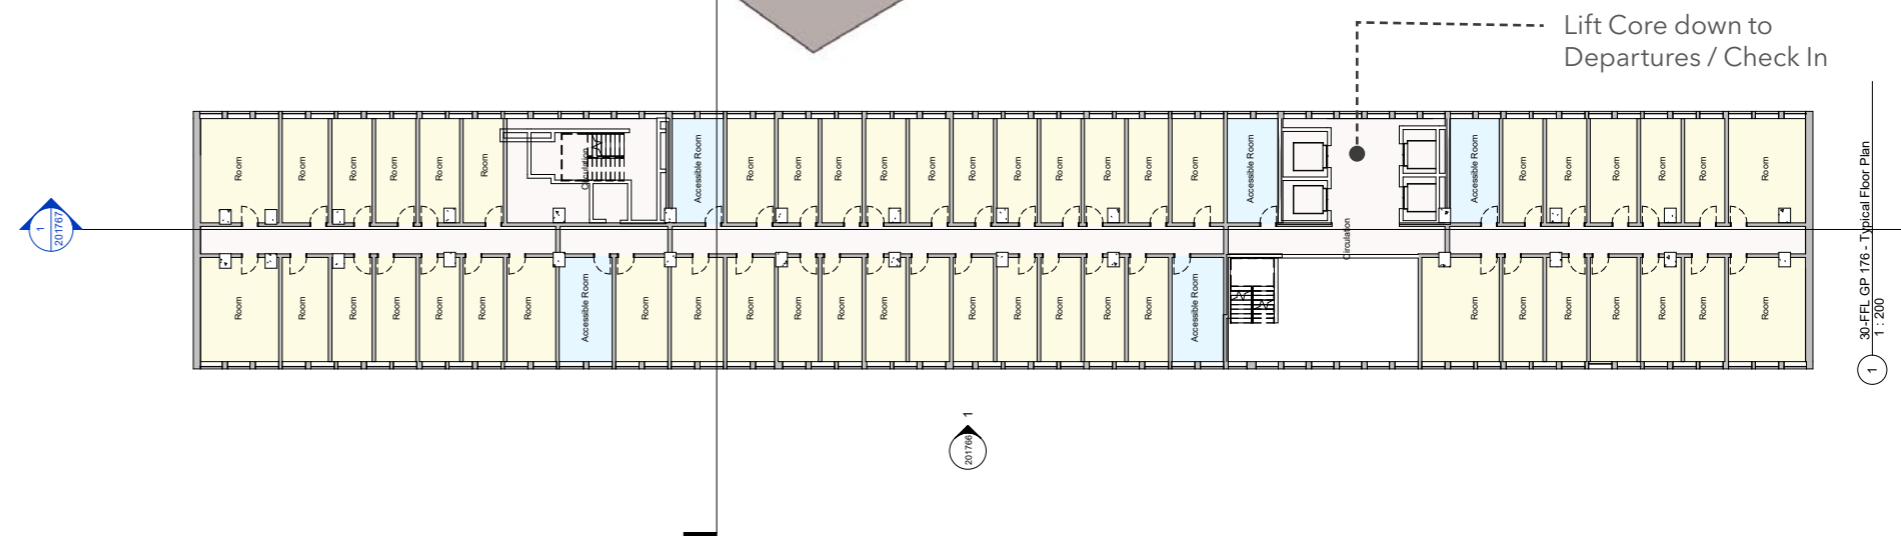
Proposed Typical Floor Plan -Destinations Place Hotel
